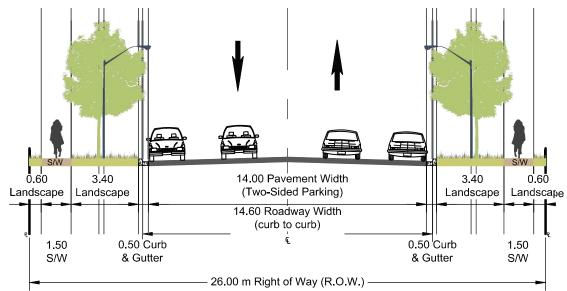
Conceptual cross section for 26.0m Collector Road (Street 'A')
